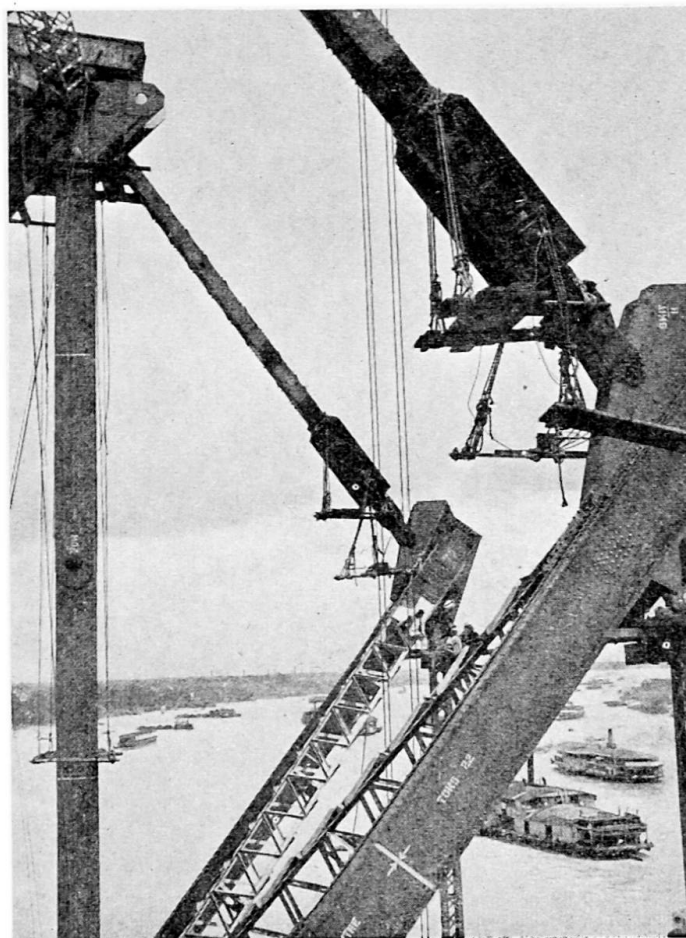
New Howrah Bridge, Calcutta. Temporary adjustable members with 200-ton jacks being used for prestressing of cantilever arm
